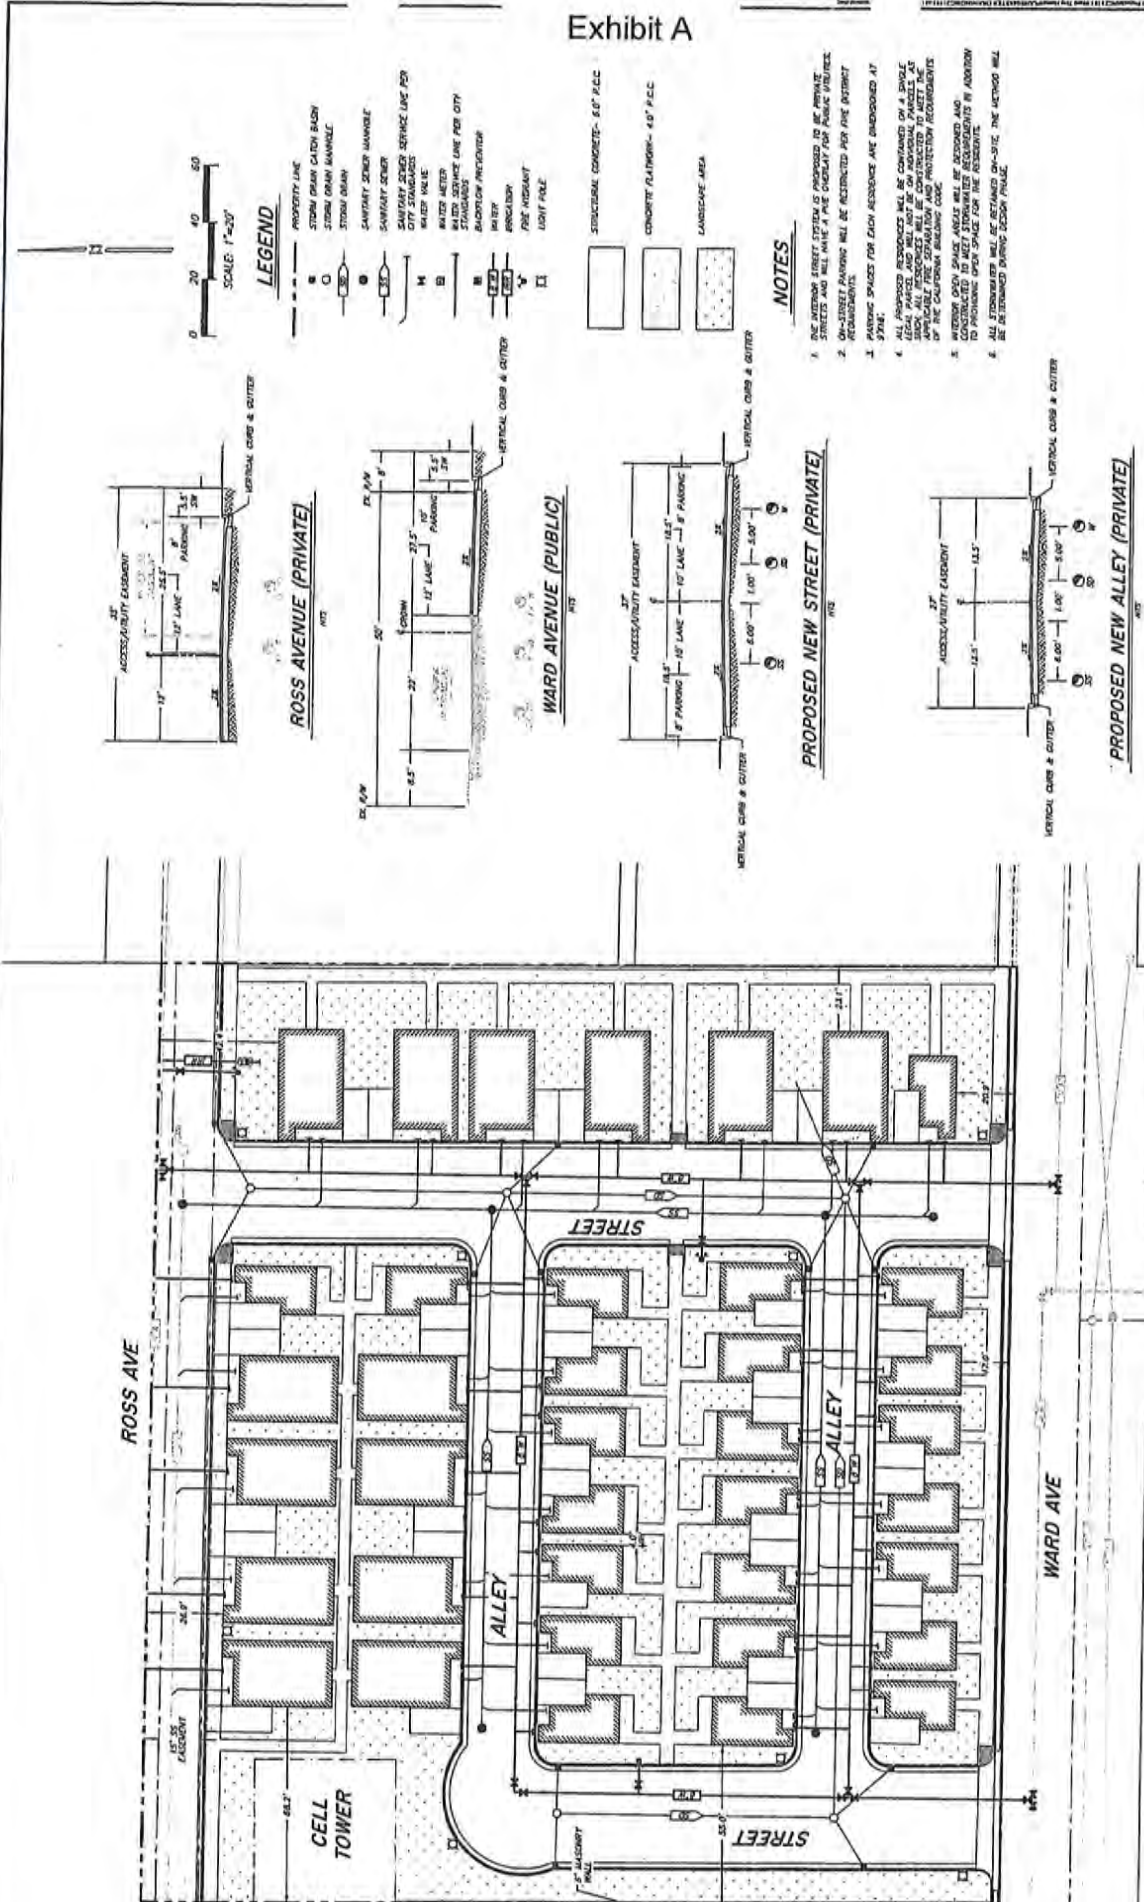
Exhibit A – Lucky House Tiny Homes Site Plan Floor Plan and Elevations.
